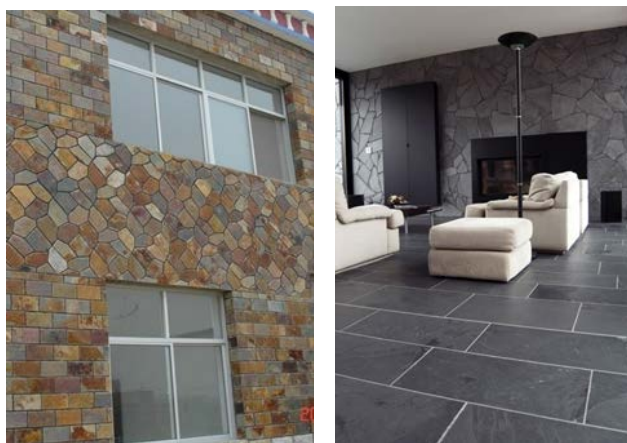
Slate applications as a cladding material: a) Multicolor slate façade, b) Jack Black slate flooring [23]
